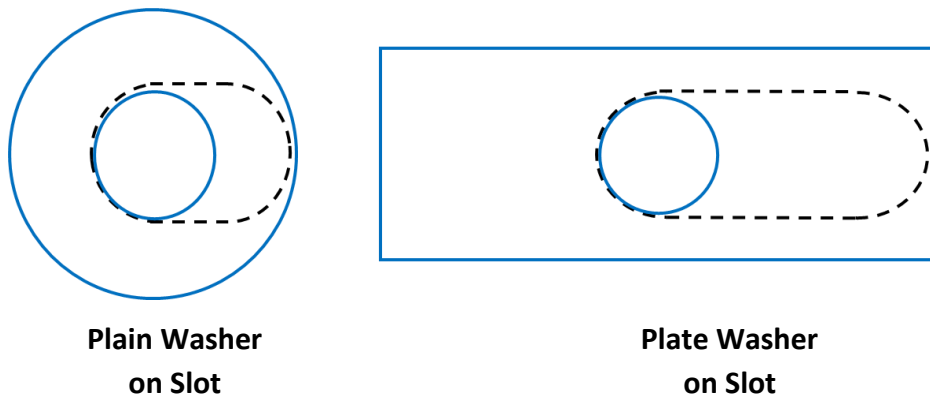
Sketches of plain and plate washers with outside dimensions large enough to cover the slotted hole.
